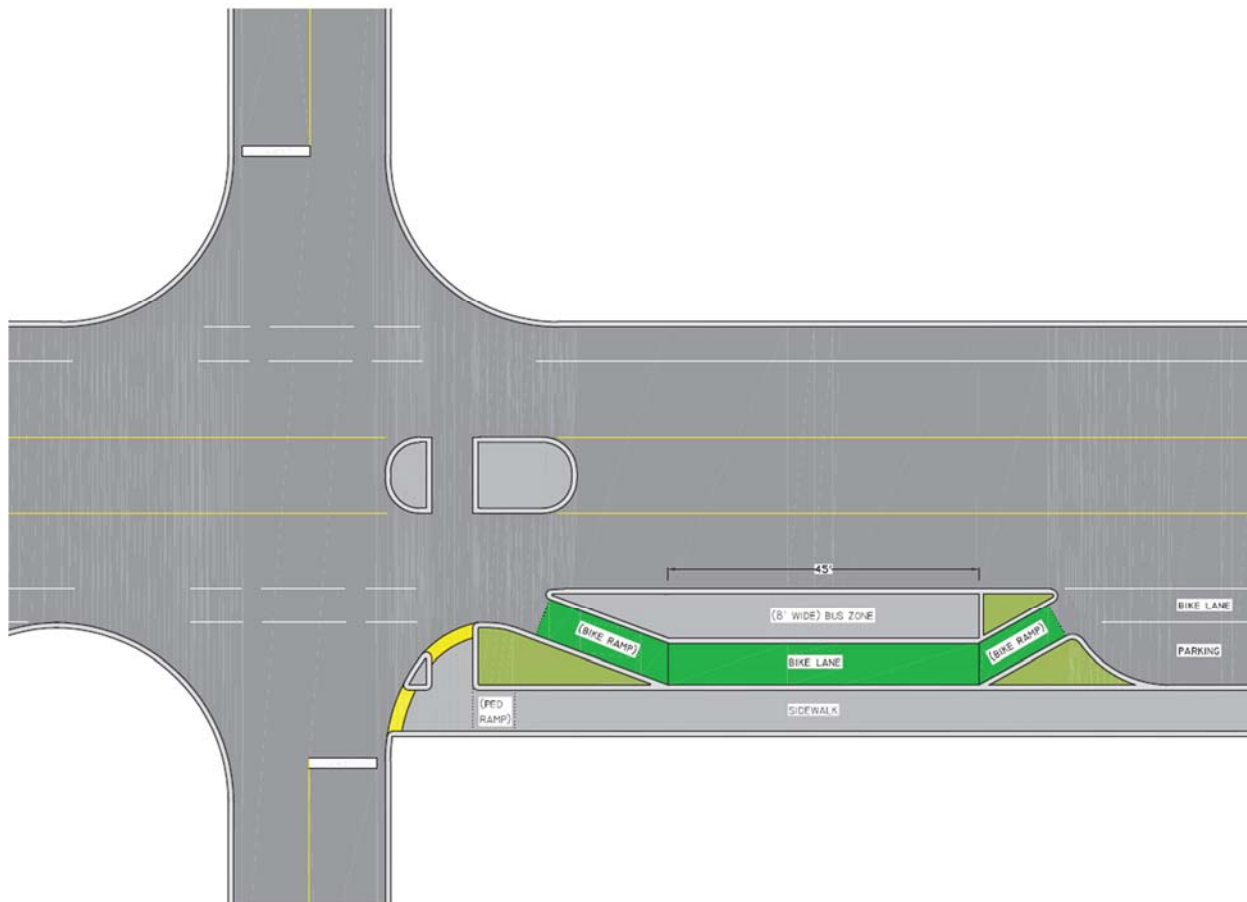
Bulb-out with Bike Ramps (Source: Spokane Transit)
